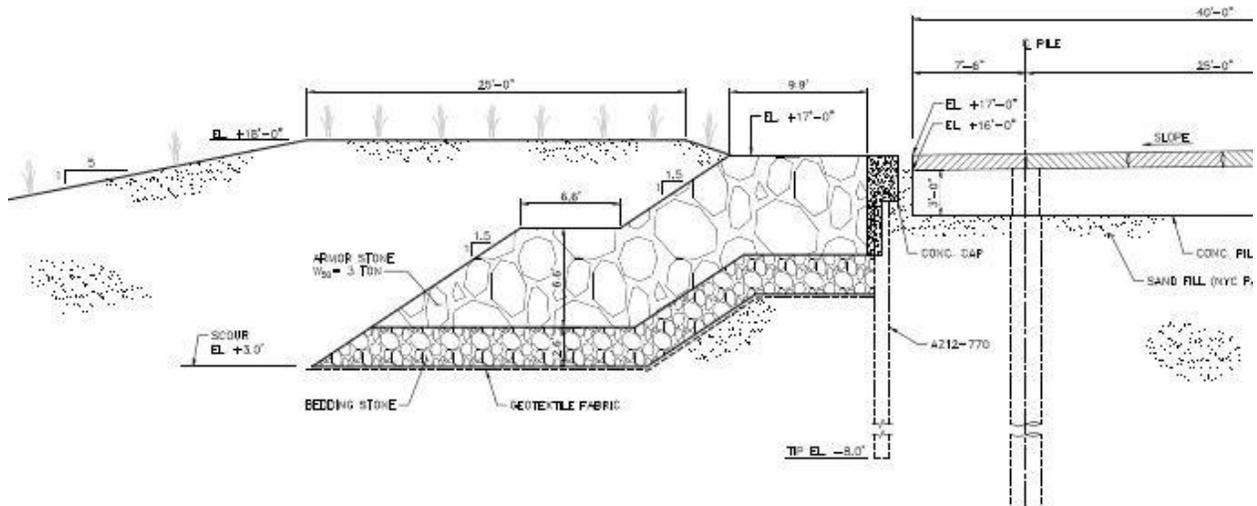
Composite Seawall Beach 19th St. to Beach 126th St
